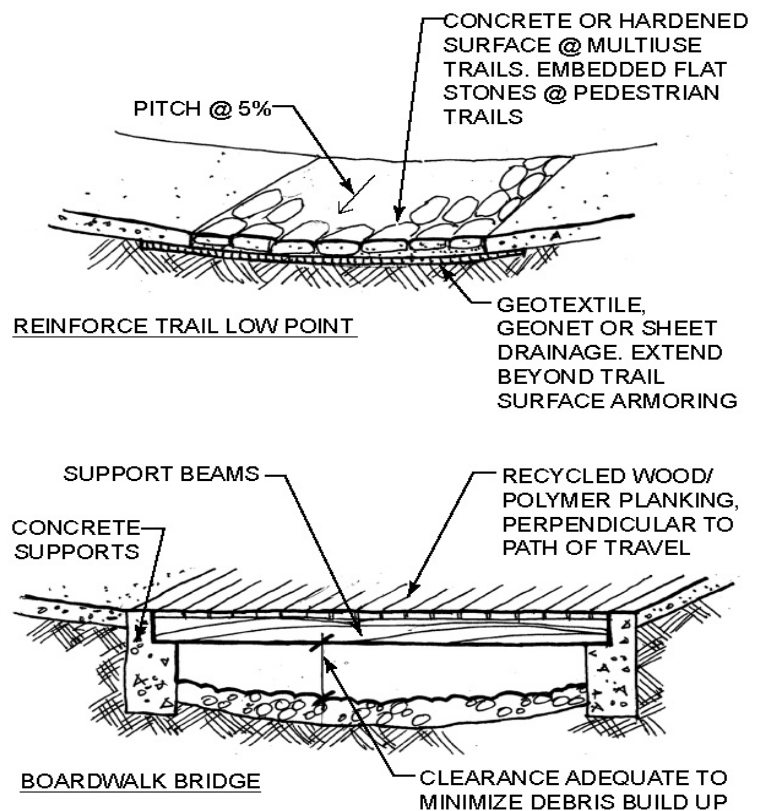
SURFACE REINFORCING AND BRIDGE
